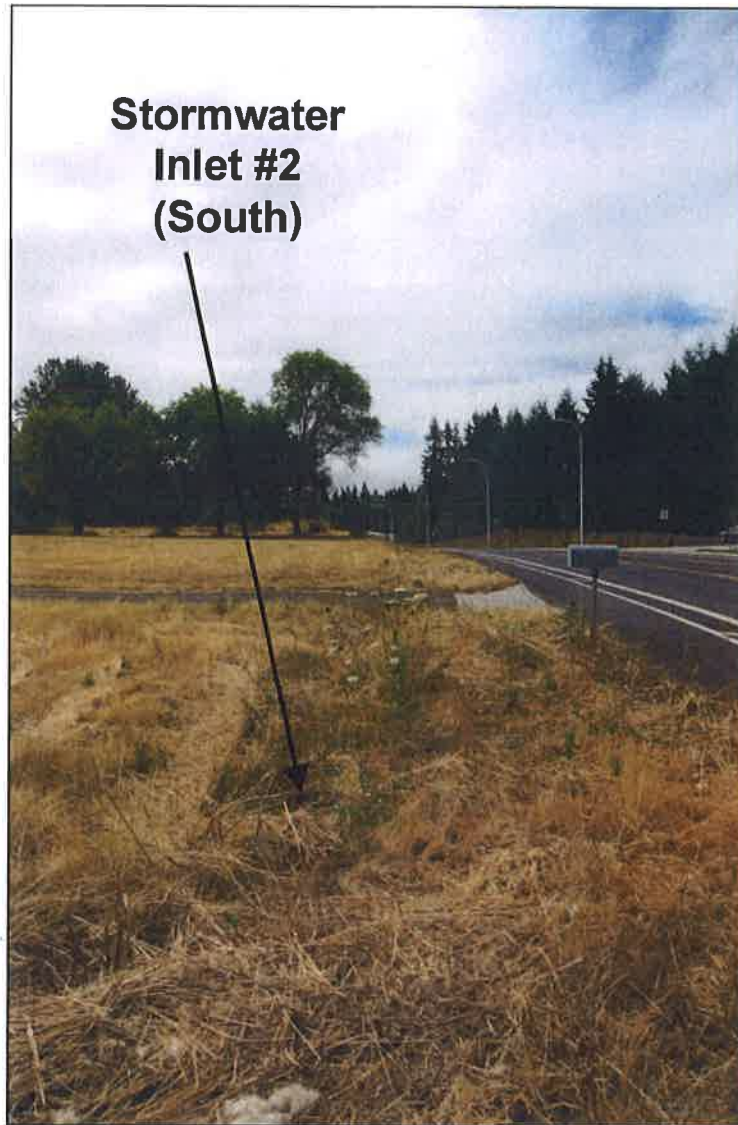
Looking southerly at widened road. The new stormwater Inlet #2 (South) is in the foreground. The curbing on the east edge of the road (on left) now blocks the adjacent catchment stormflow and redirects it to the culvert discharging to the Lucini property. This photo was taken by LEA on July 16, 2015.
